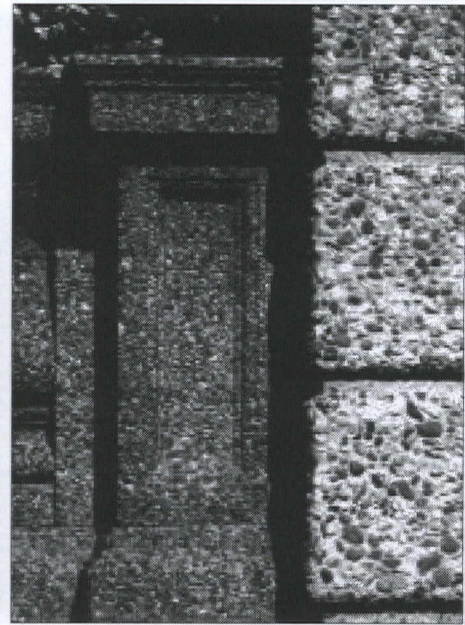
Exposed aggregate was used in various sizes. The work to the right in the photograph is unusually varied for the park and may be either replacement concrete or early in the park's construction before perfection of the construction techniques, 1996, see plan sheet 28 (Land Ethics, Inc.).
